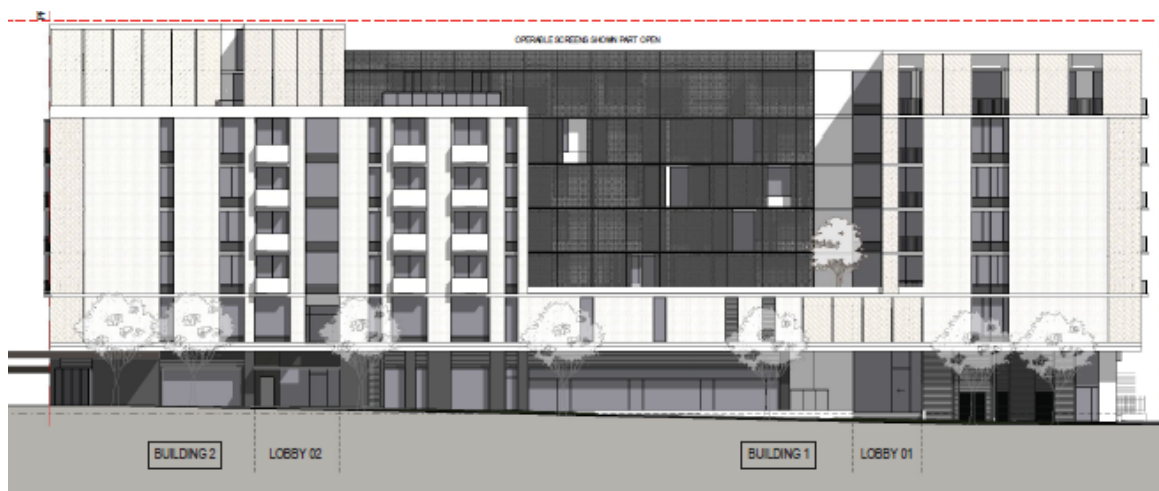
Lachlan Street elevation of Buildings 1 and 2
